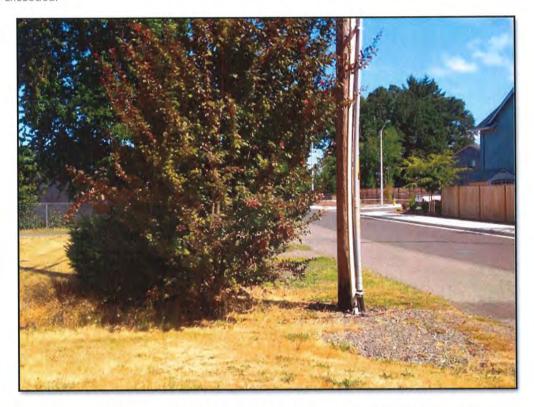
Sight Distance Looking East from Proposed Access Intersection
